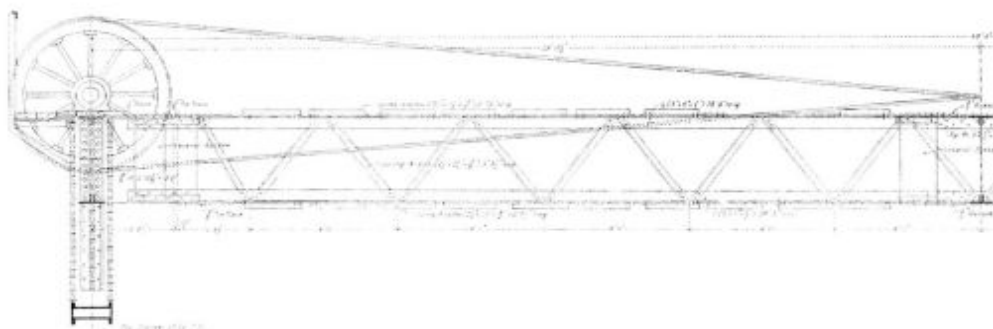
Elevation of Gonn Crossing sheave and tower brace arrangement
